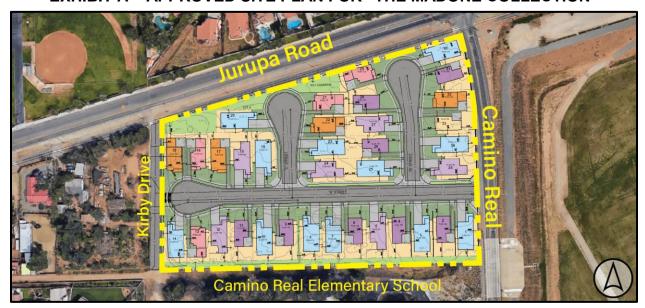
EXHIBIT A – APPROVED SITE PLAN FOR "THE MADONE COLLECTION"
